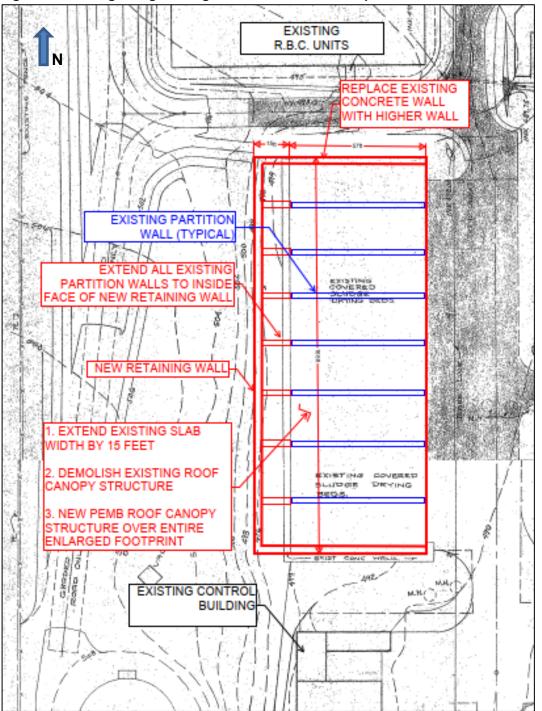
Existing Sludge Storage Area Site Plan and Proposed Modifications
